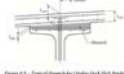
Typical Flow Edge-Under-Deck Bridge
